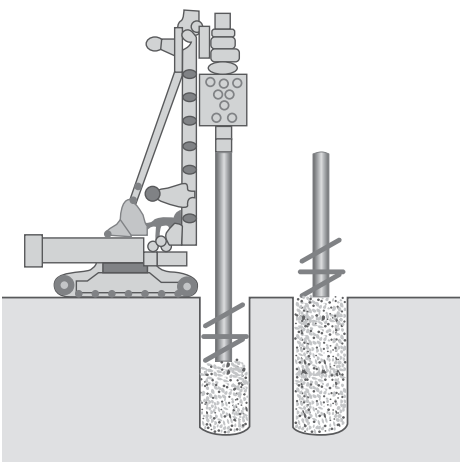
Deep Mixing (Soil Mixing) Technique
